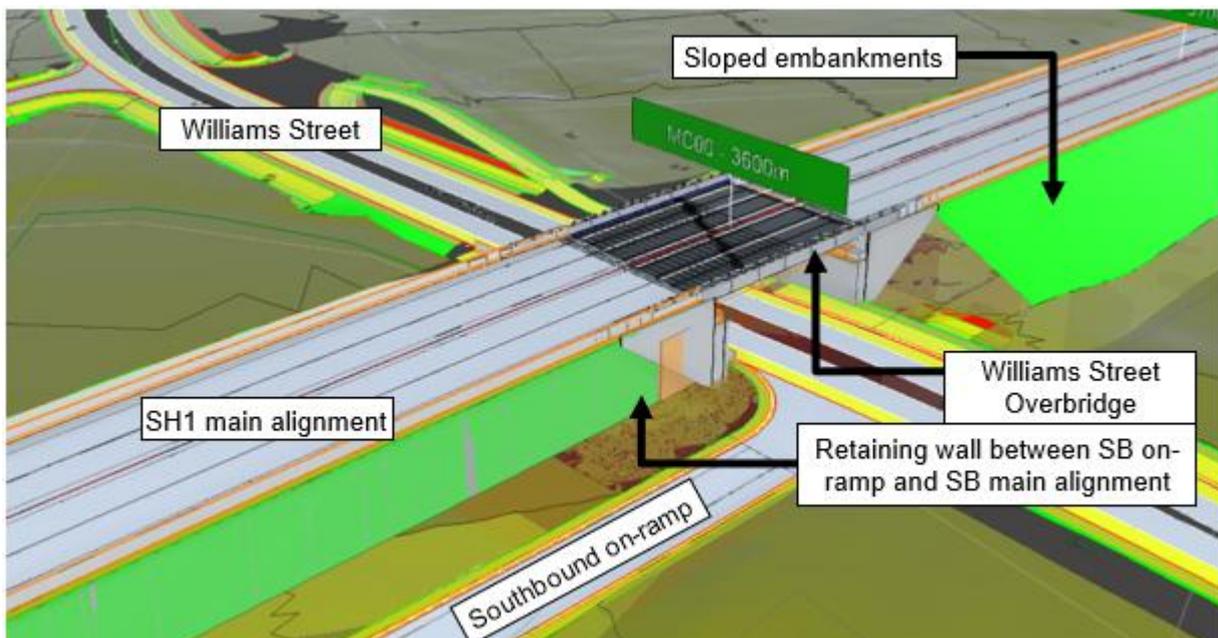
3D Illustration of Williams Street Bridge Design
